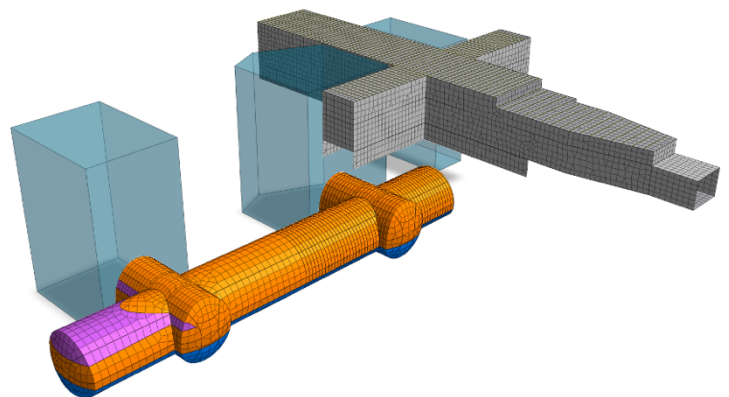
3D Finite Element Model of Westlake Station Cavern and Cross-Cut excavation sequences with shafts and existing structures.
